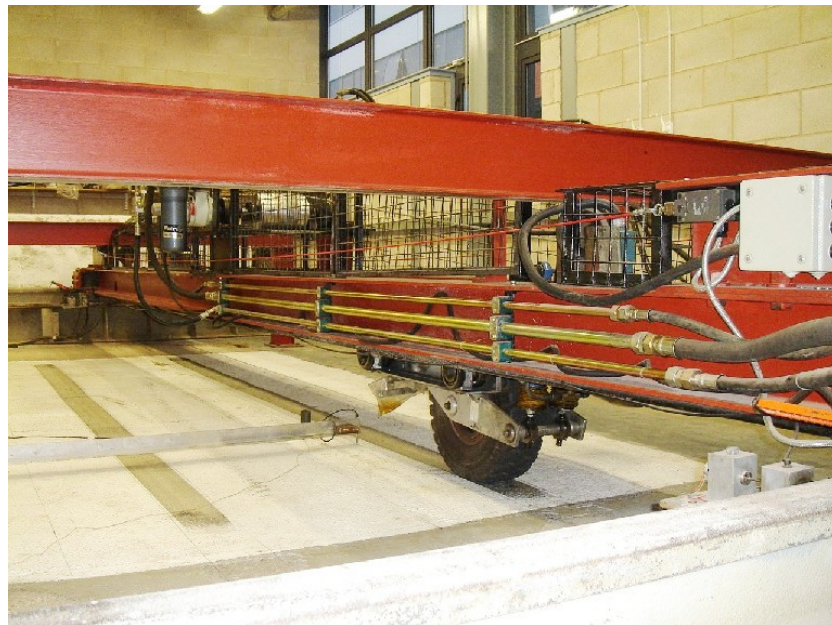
General view of the Pavement Test Facility (PTF)
